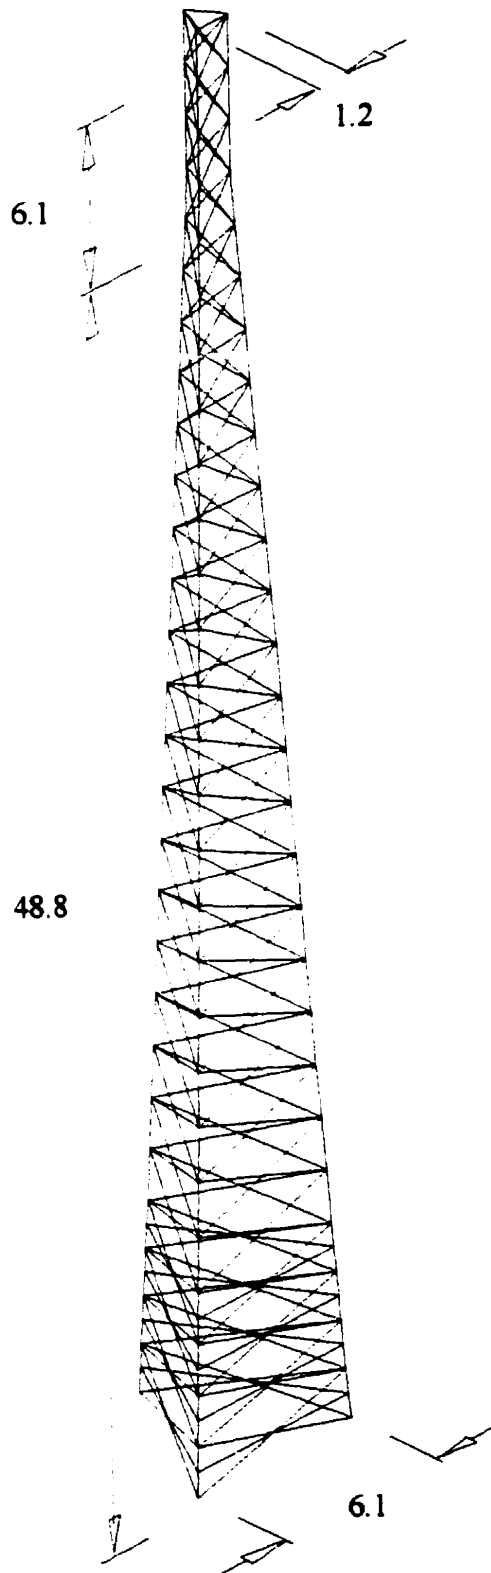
Layout of tower TC9 (dimensions are in m)
